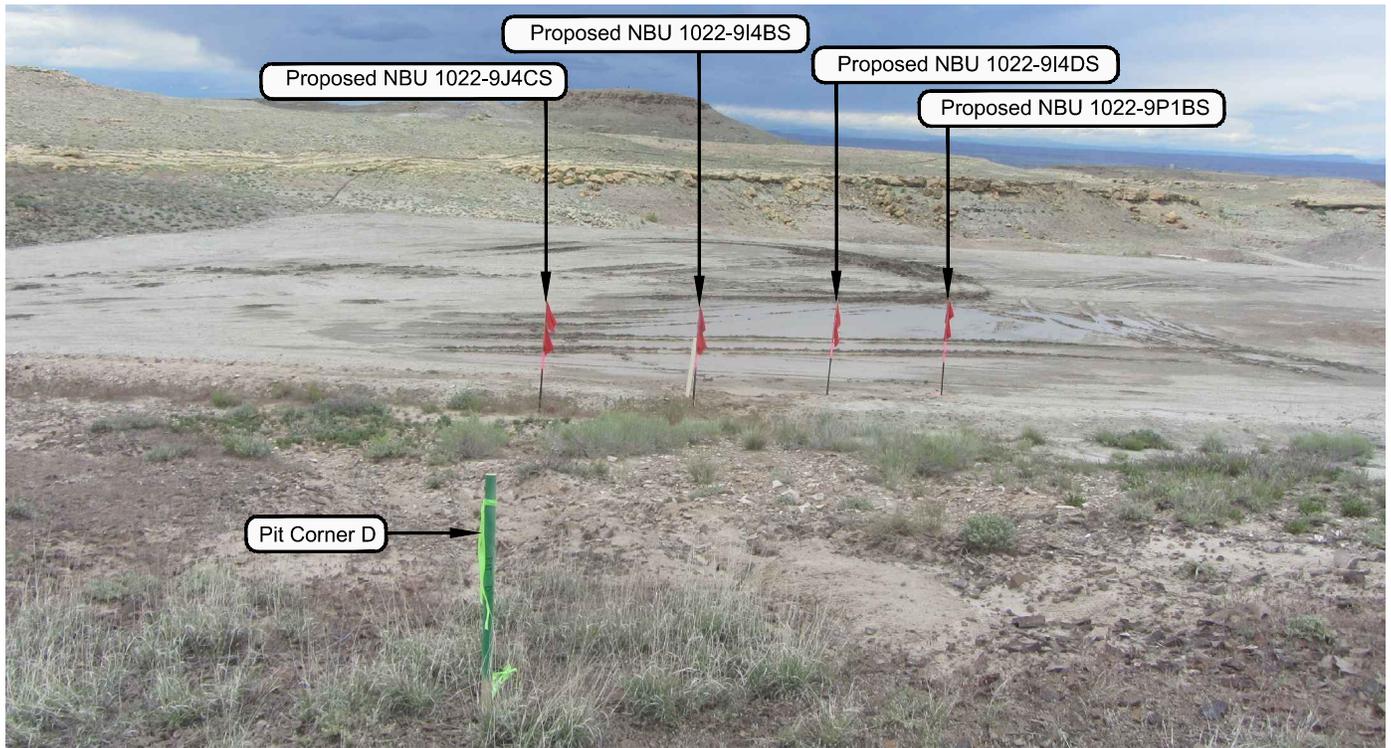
PHOTO VIEW: FROM PIT CORNER D TO LOCATION STAKE
